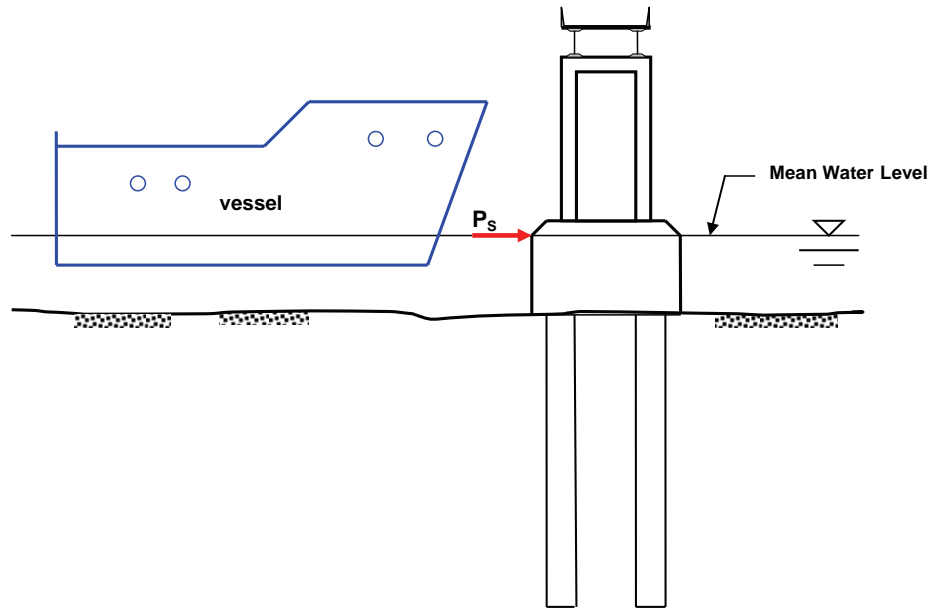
Design Impact Force, Ship Colliding with Bridge Pier
